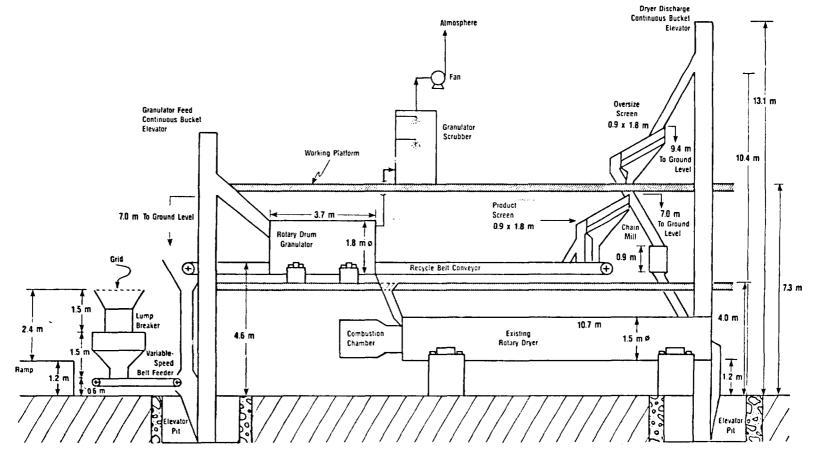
Step 1 Elevation View—ROP-PAPR 10-mtpt, Plant
